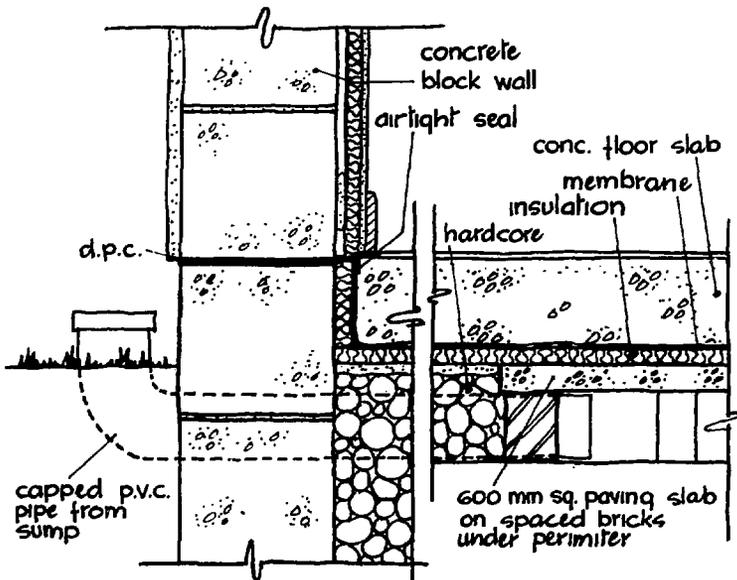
SECTION SHOWING UNDERFLOOR SUMP
